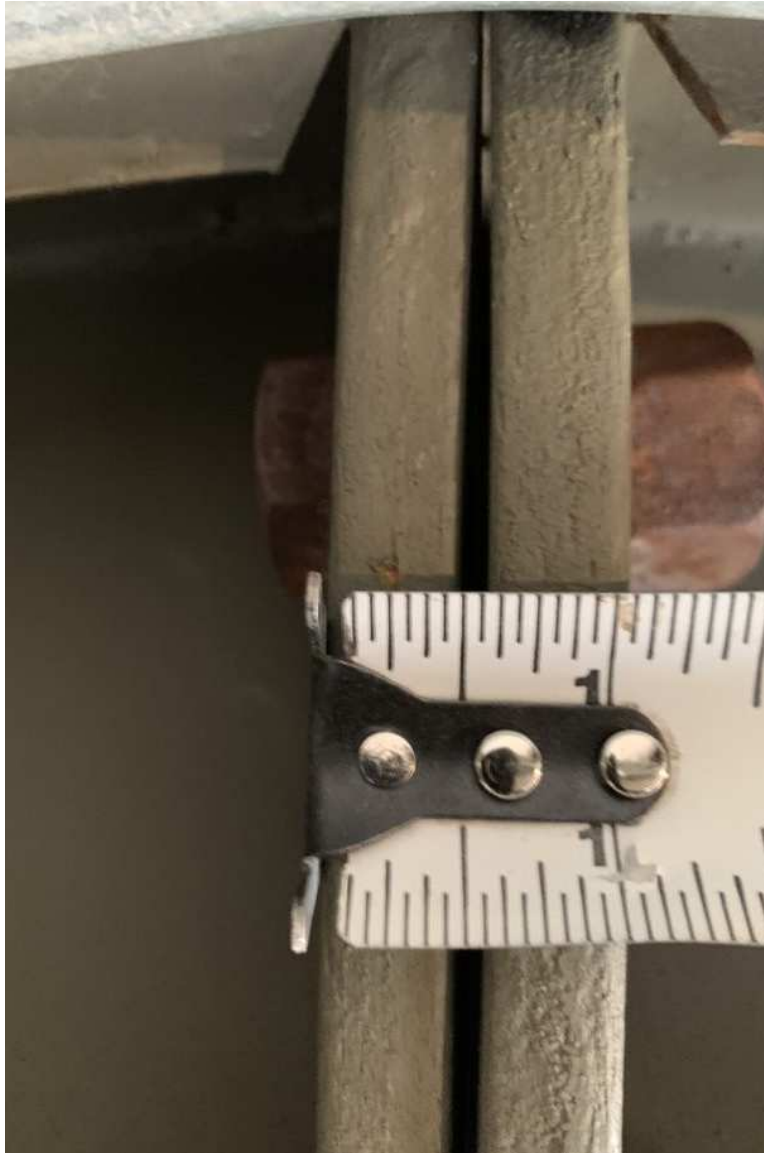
IMG\_6465 – Building 1, Storage unit adjacent to Unit 1 – Exemplar photograph of bolts requiring tightening to snug-tight condition.
